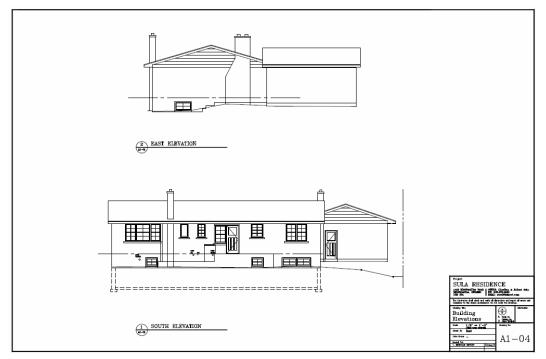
1422 Mississauga Road, East and South Elevations. (Image provided by the property owner.)
